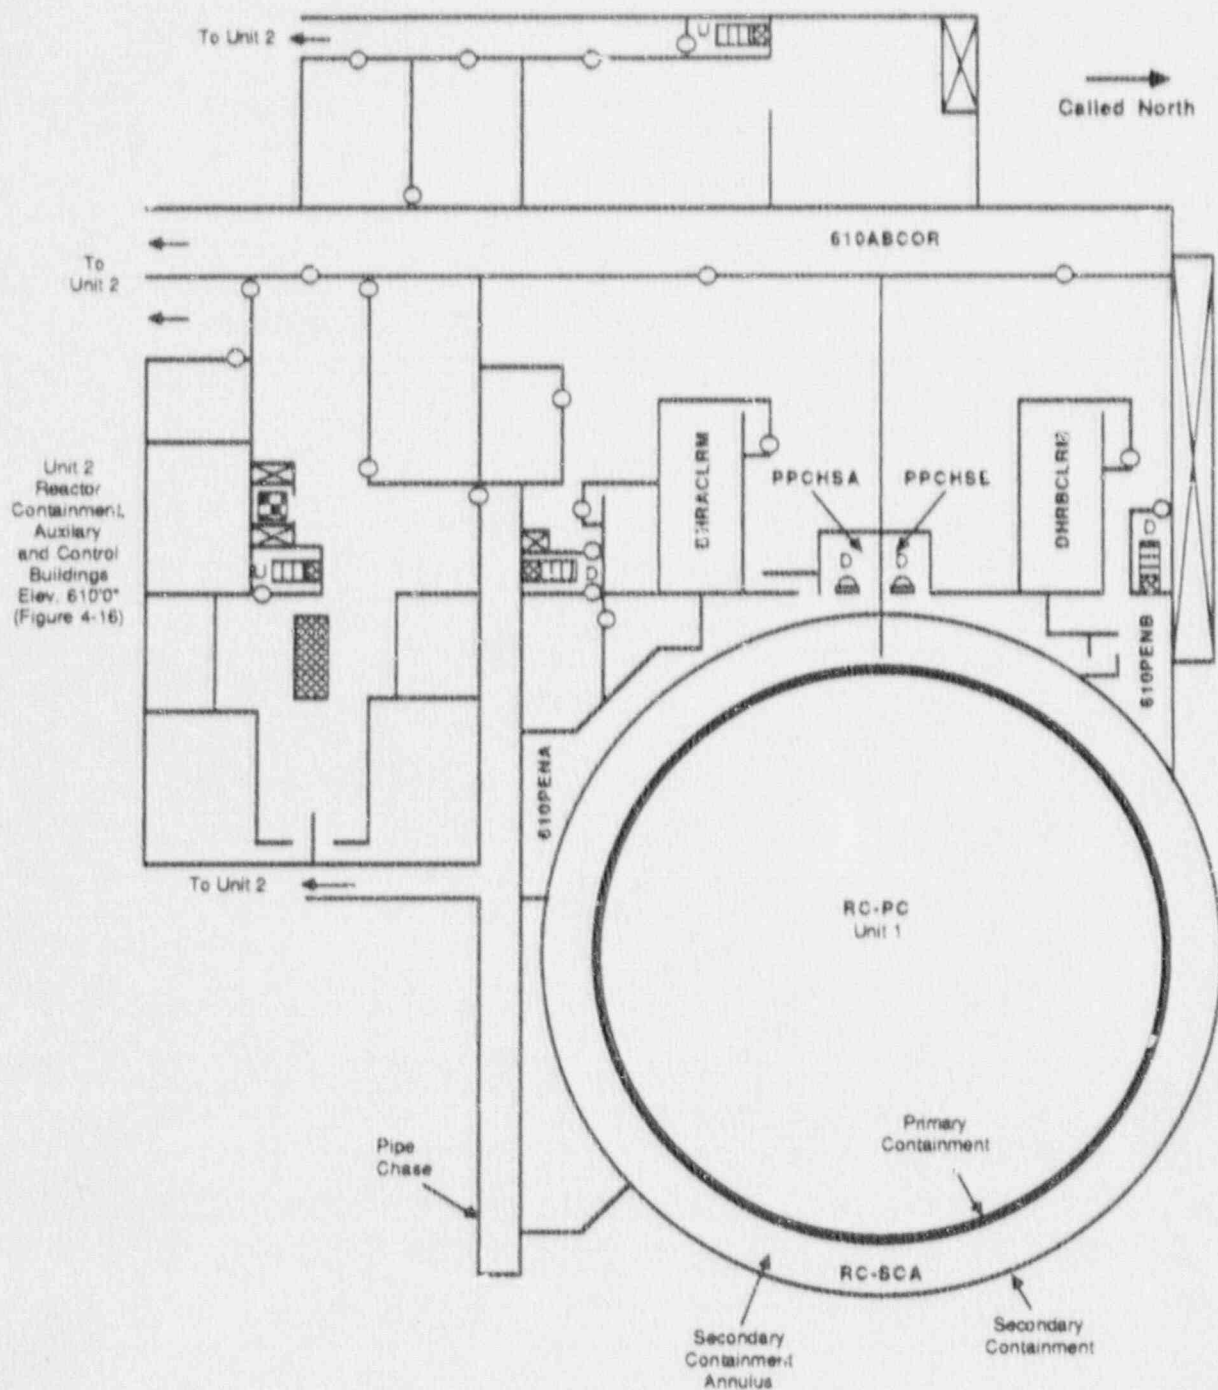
Bellefonte 1 Reactor Containment, Auxiliary and Control Buildings, Elevation 610'-0"
